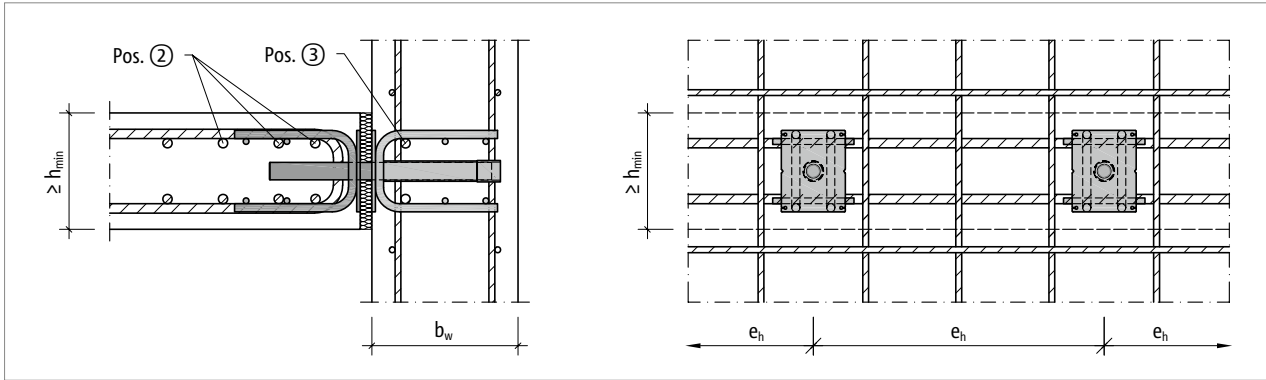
Schöck Stacon® type SLD: on-site reinforcement with floor-wall connection
